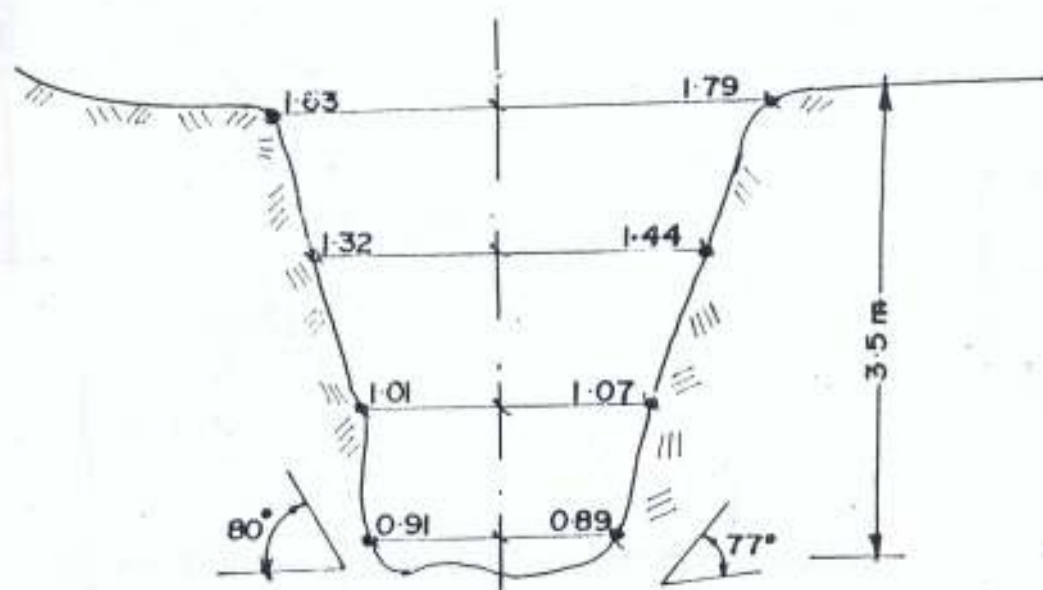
TYPICAL SECTION OF IBETE GULLY
